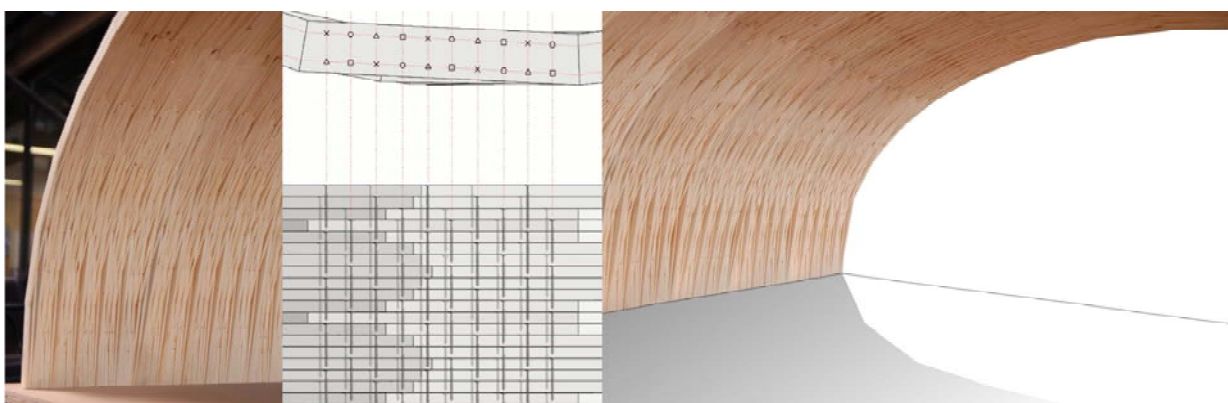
Reduced scale model and assembling detail of a Bezier vault construction realized out of screwed timber planks.
